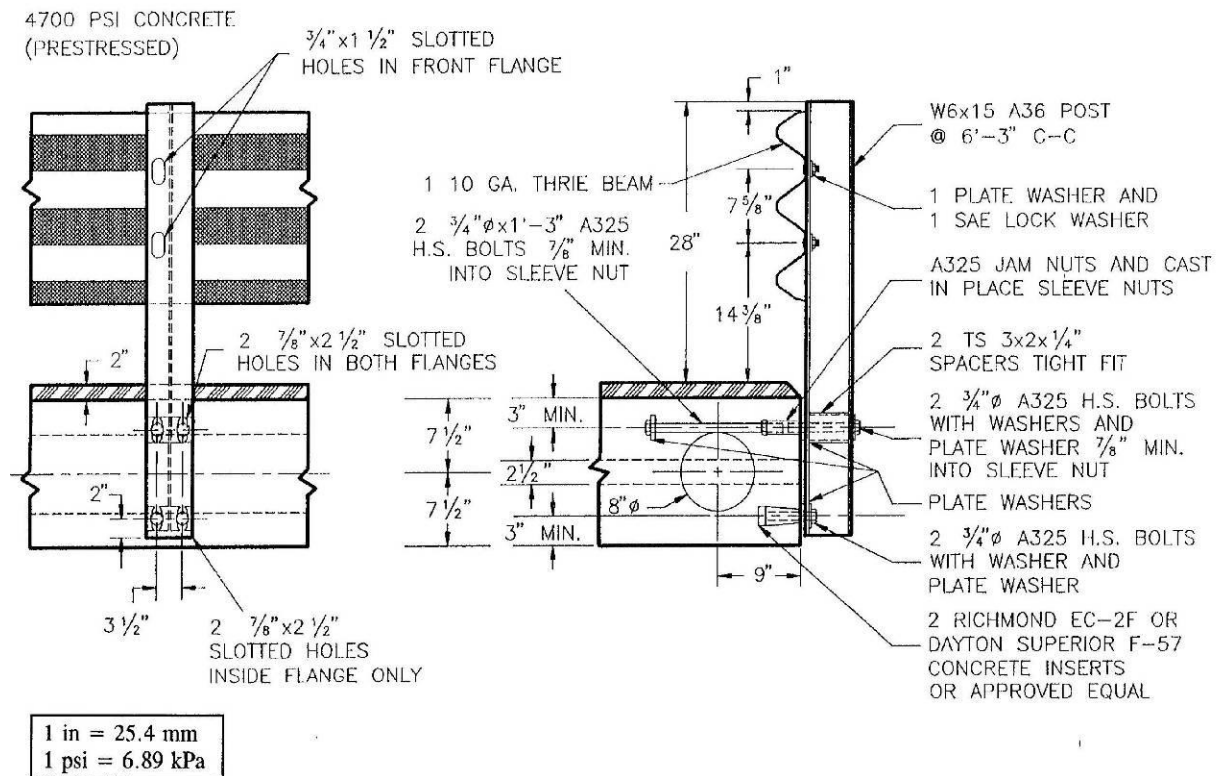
Oregon side-mounted bridge rail installation (8)
